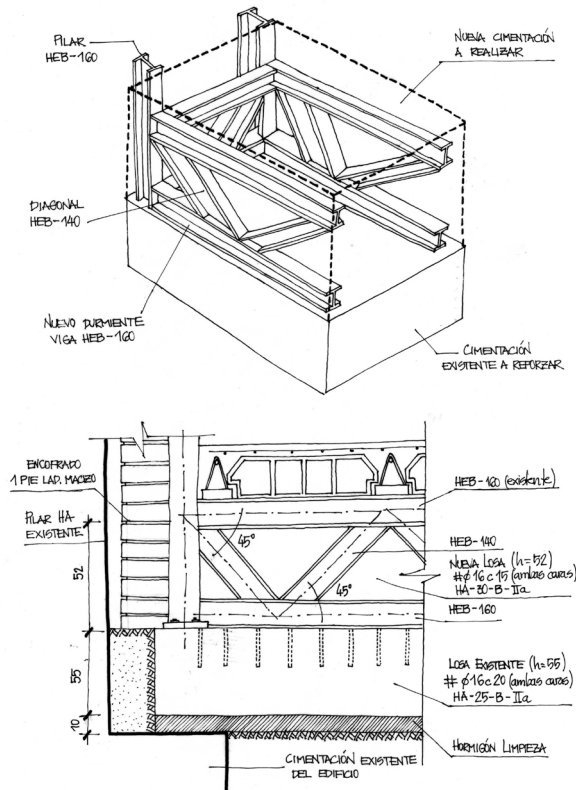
Construction detail of structural reinforcement (graphic elaboration by the authors).
